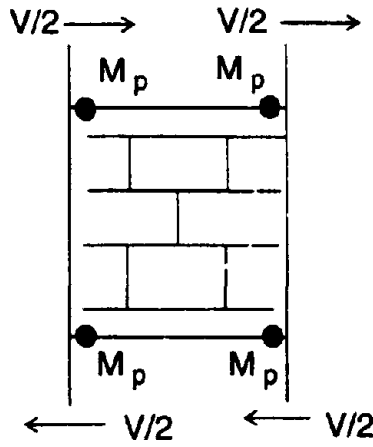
Boundary Conditions of Infill Frame Subassemblage
